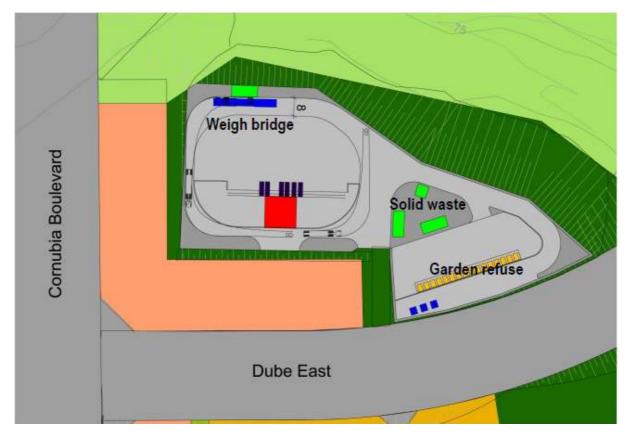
Proposed layout of the preferred location for the new transfer station
